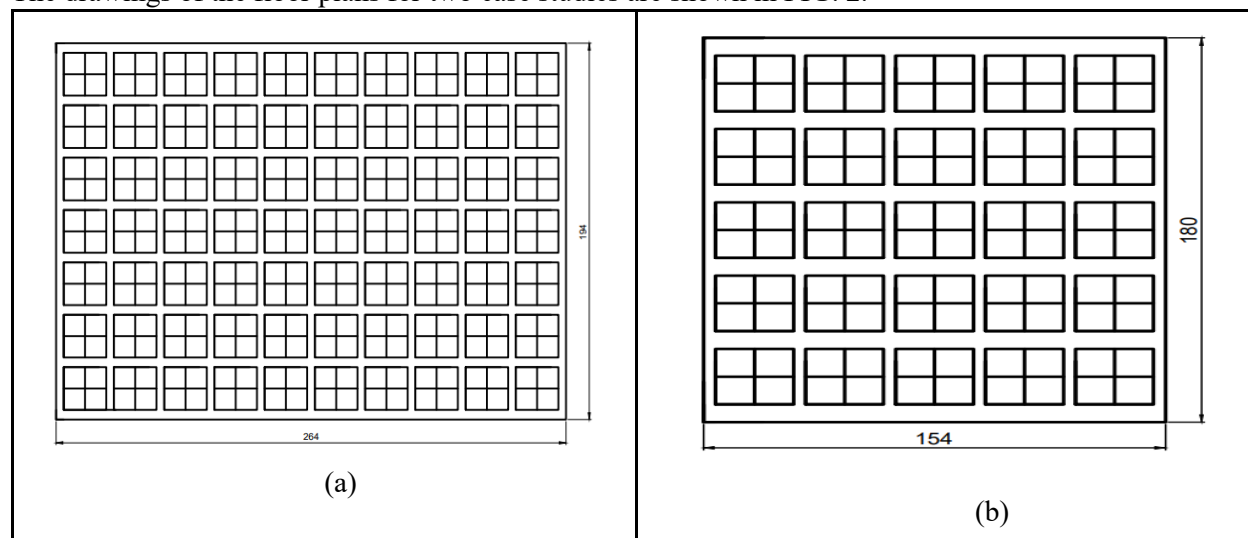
Building Floor Plan (a) Building Plan-1 (b) Building Plan-2
